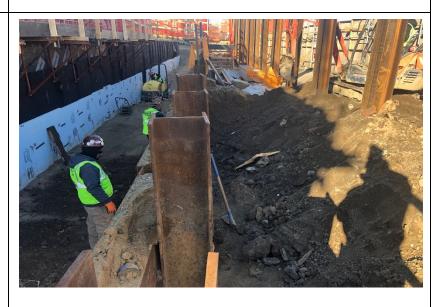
Looking northwest, Structure Tech completes waterproofing and insulation work on the north side of the boiler house superstructure.
